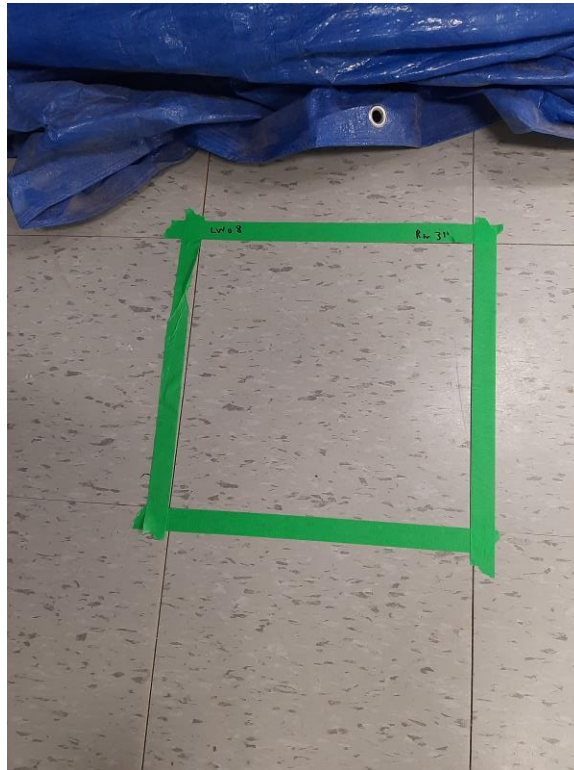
LW05 – 4th Floor Corridor - Wall
